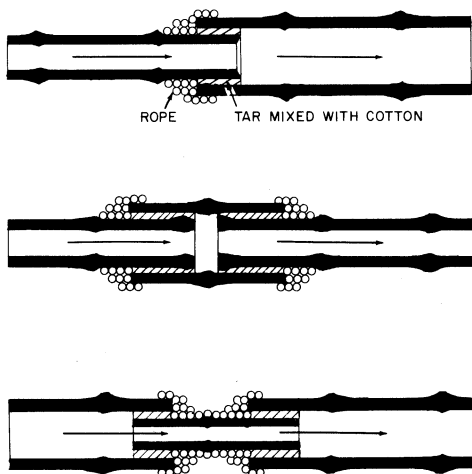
Construction of joints in bamboo pipe; three possible methods. (From McJunkin).
